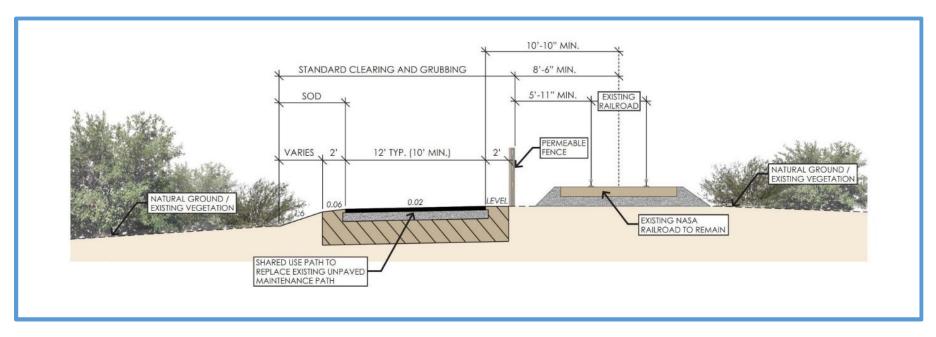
Typical Section, E-W MINWR Alternative 2 and E-W CANA Alternatives 2A and 2B (along NASA Railroad)
